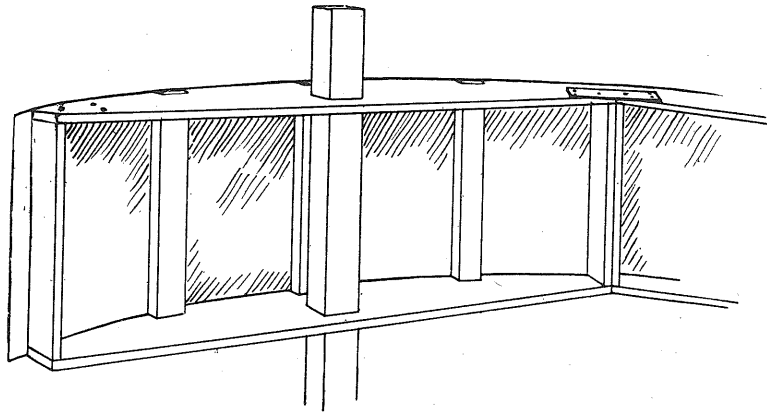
INSIDE VIEW OF INSIDE FORM
